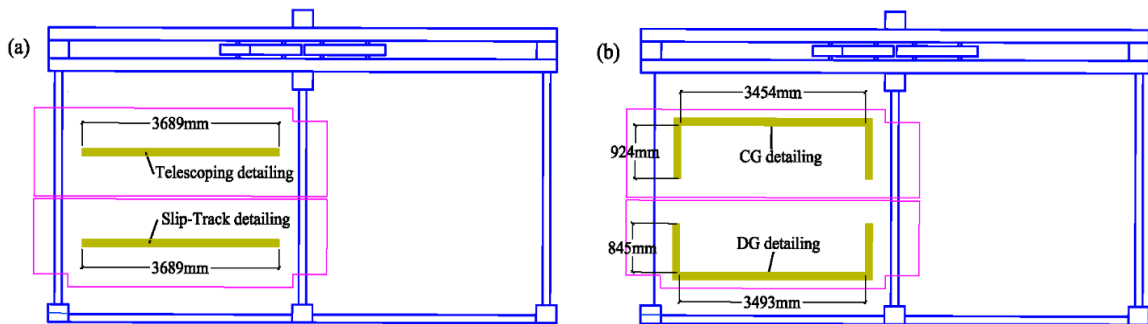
Placement of walls in the test-bed structure and dimension of walls; (a) Phase 1, (b) Phase 2.
